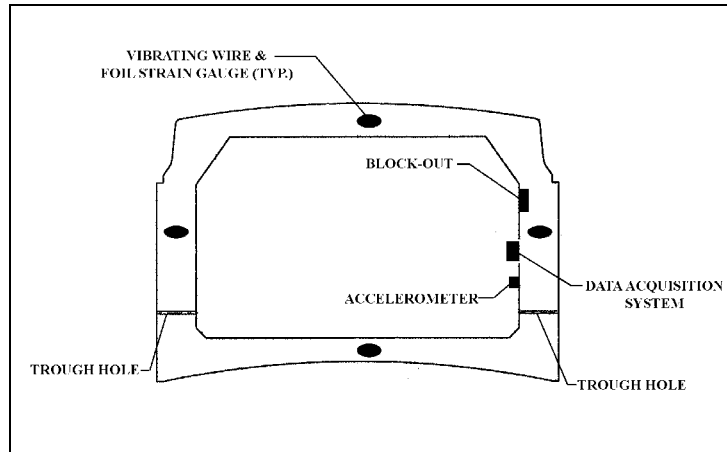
Tie-Beam Type-I Gauge Locations (Modified IRIB Specifications and Construction Plans)
